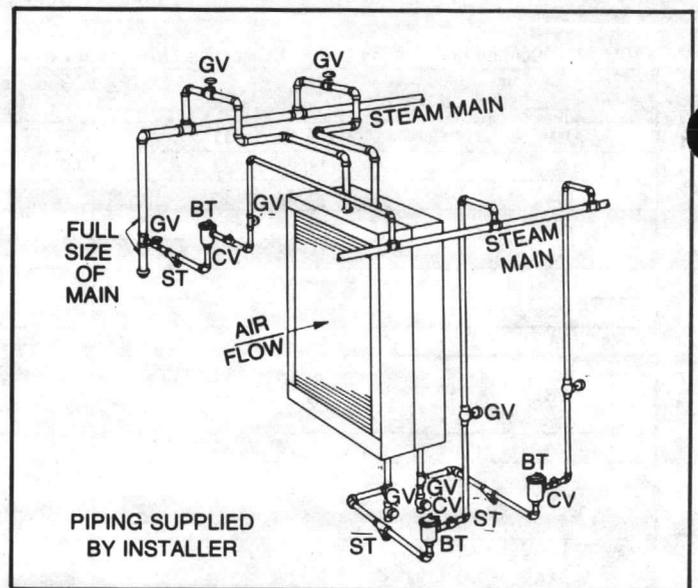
Typical Piping for Type A Steam Coils, High Pressure, Vertical Tubes for Horizontal Airflow
